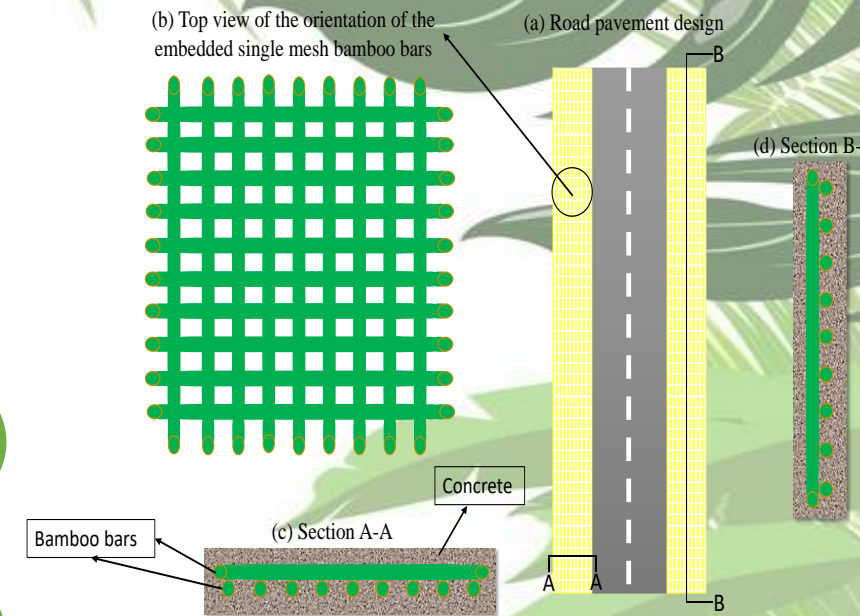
Design of embedded internal bamboo reinforcement in road pavements.
